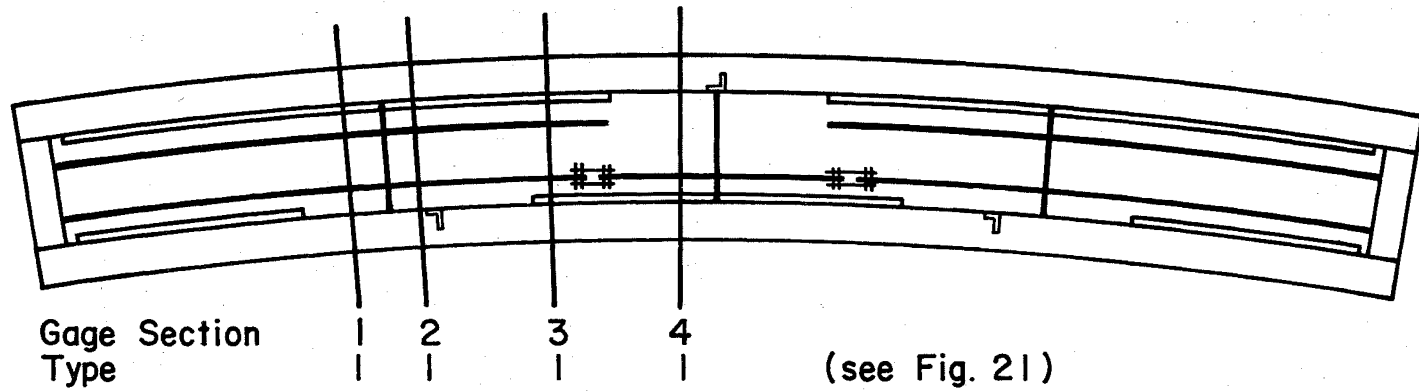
Plan of Box Girder Instrumentation - Girder 2
